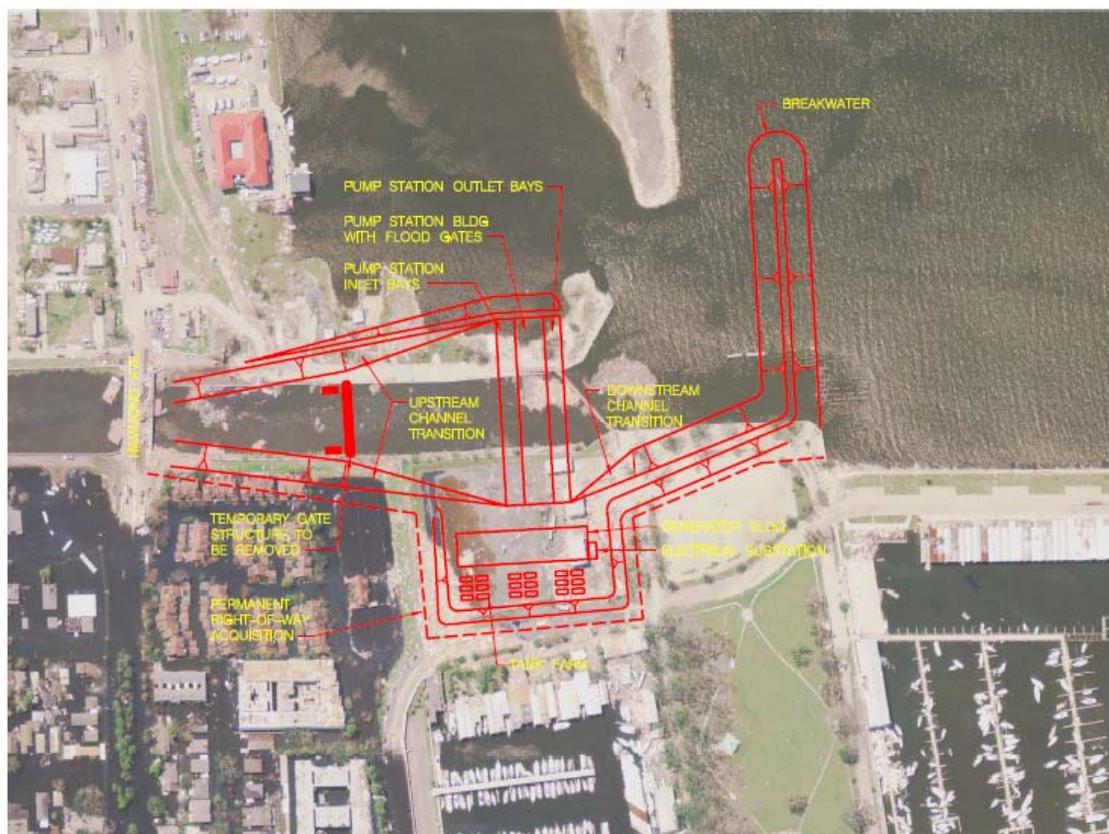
Hoey's Basin Drainage Area and Proposed Pump Station
